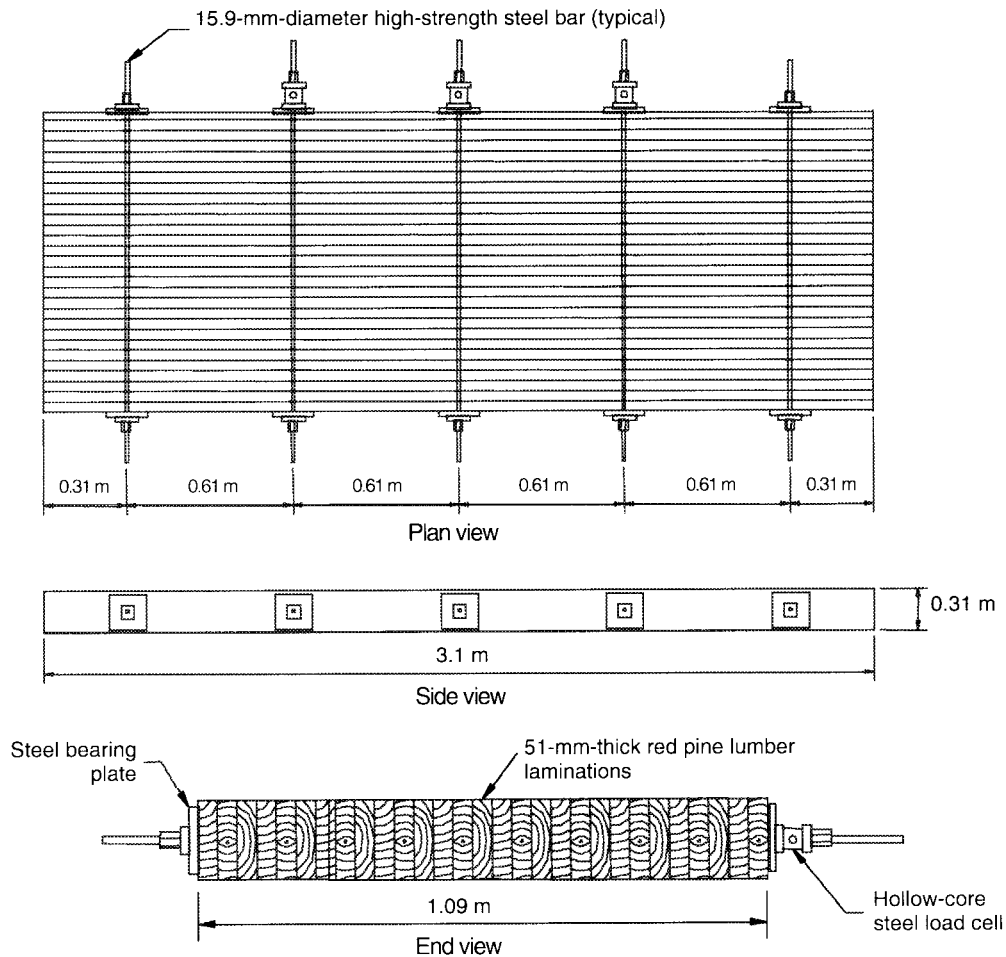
Typical configuration of stress-laminated deck section used in testing.
